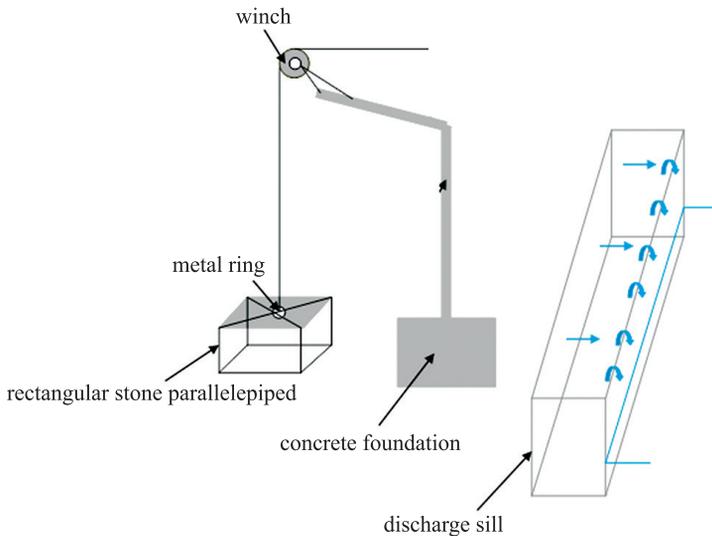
Positioning the concrete pile located upstream of the discharge sill – indicative scheme
